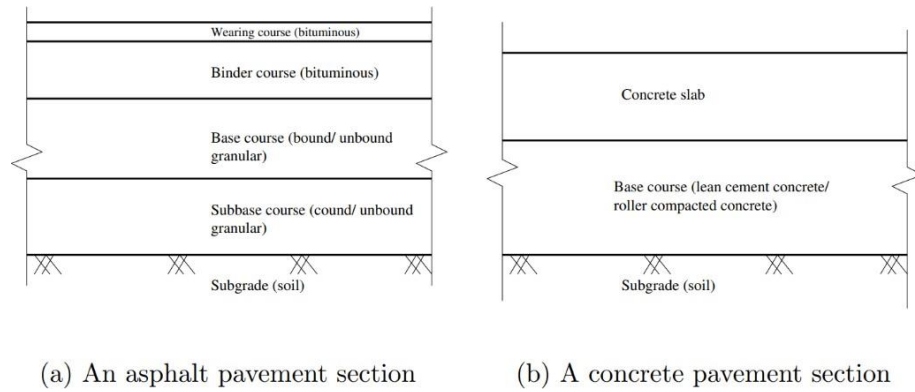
Typical cross-section of an asphalt and a concrete pavement.
